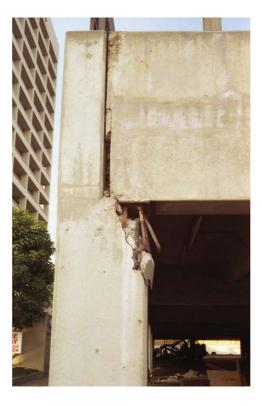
Brittle failure of beam-column pin connection at top of corner column (1994 Northridge earthquake)
